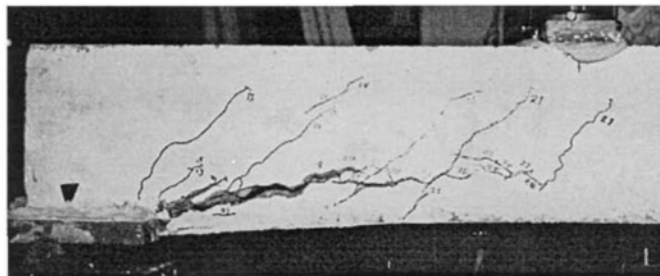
'plate-end shear failure' of beam with stirrups (CDC debonding)
